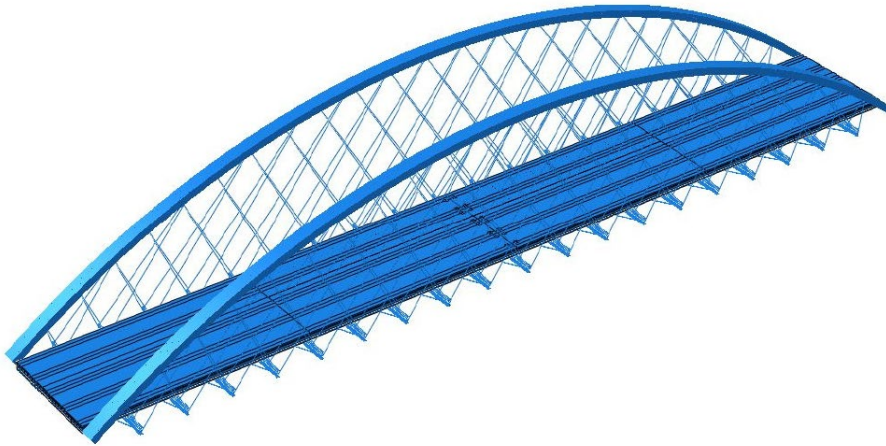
Structural model of a study for a 111 m massive arch bridge with a spoked cable configuration for the road deck (Pousette et al. 2017)
